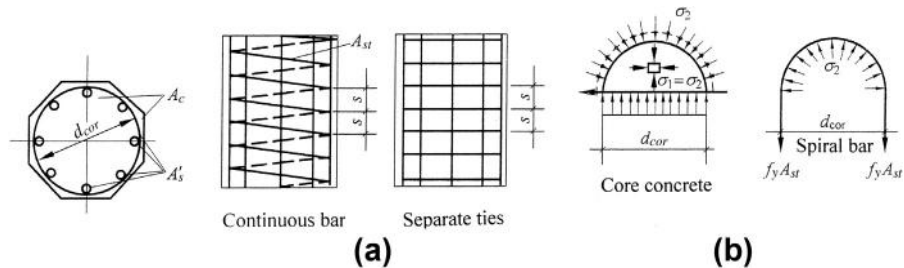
Detail and confined stress of column with spiral bar: (a) reinforcement and structural detail, (b) confined stress
